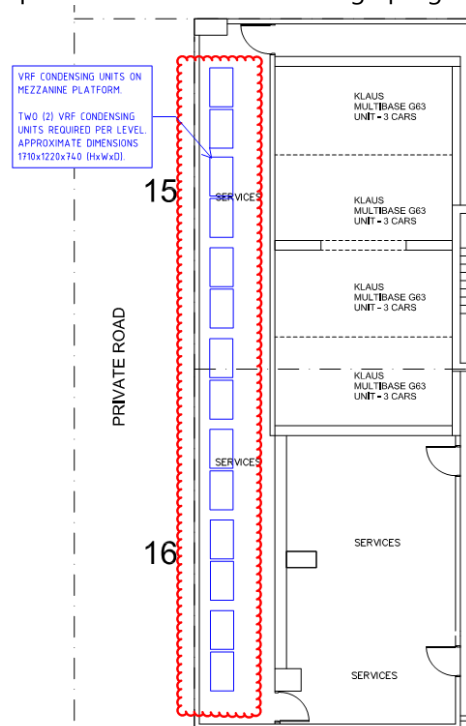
Ground Floor Mezzanine Condensing Unit Layout
